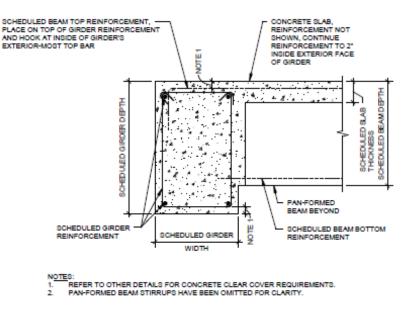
| Typical Deep Beam Cross-Section (WPM)
